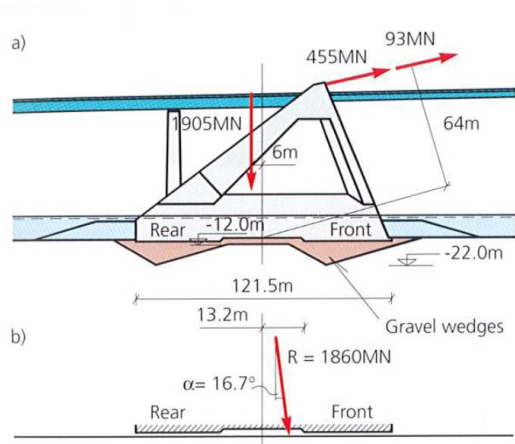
Anchor Block Structure - 1624 m main suspension span.
